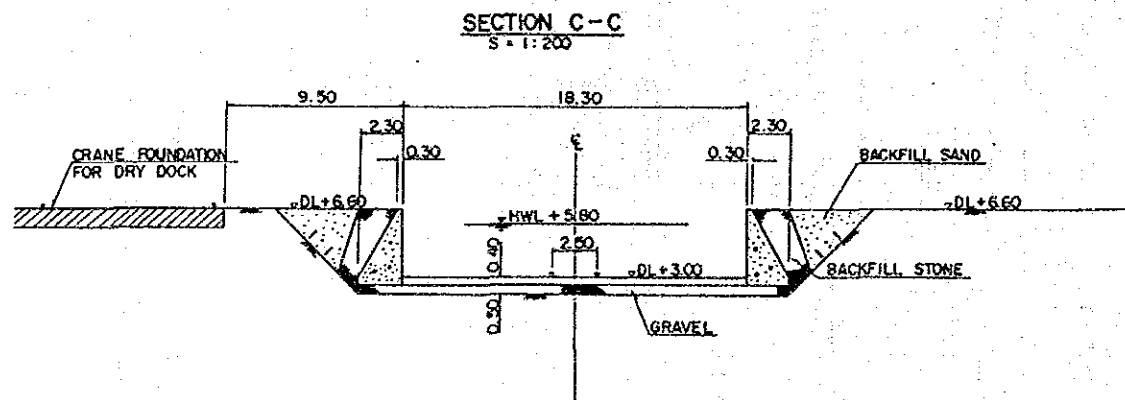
Typical Cross Section of Slipway (2/2)
